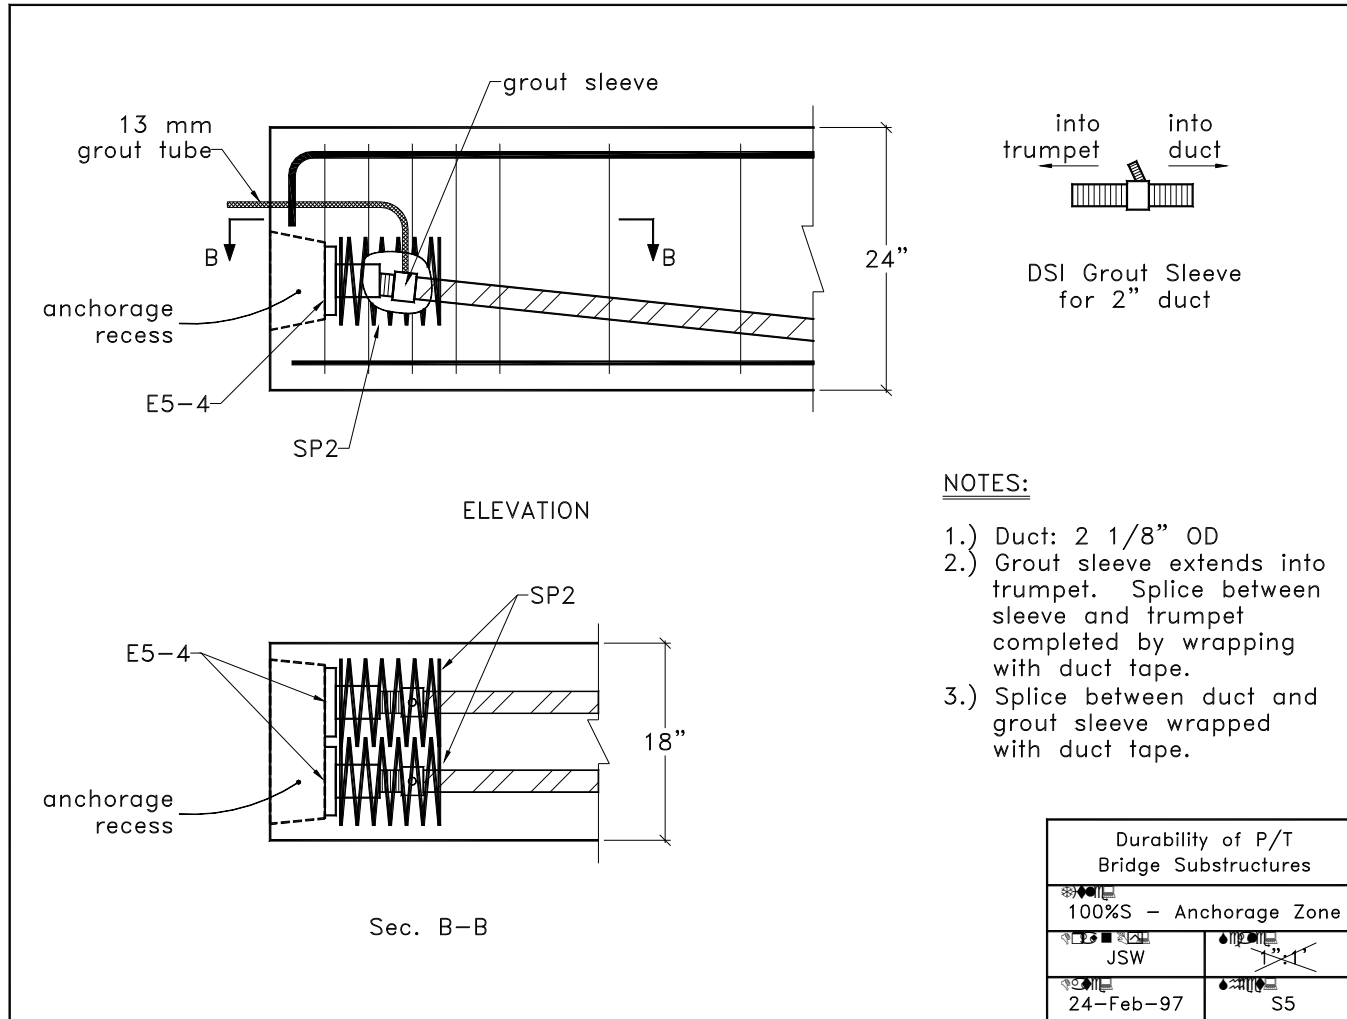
Sheet S5: 100%S Anchorage Zone
